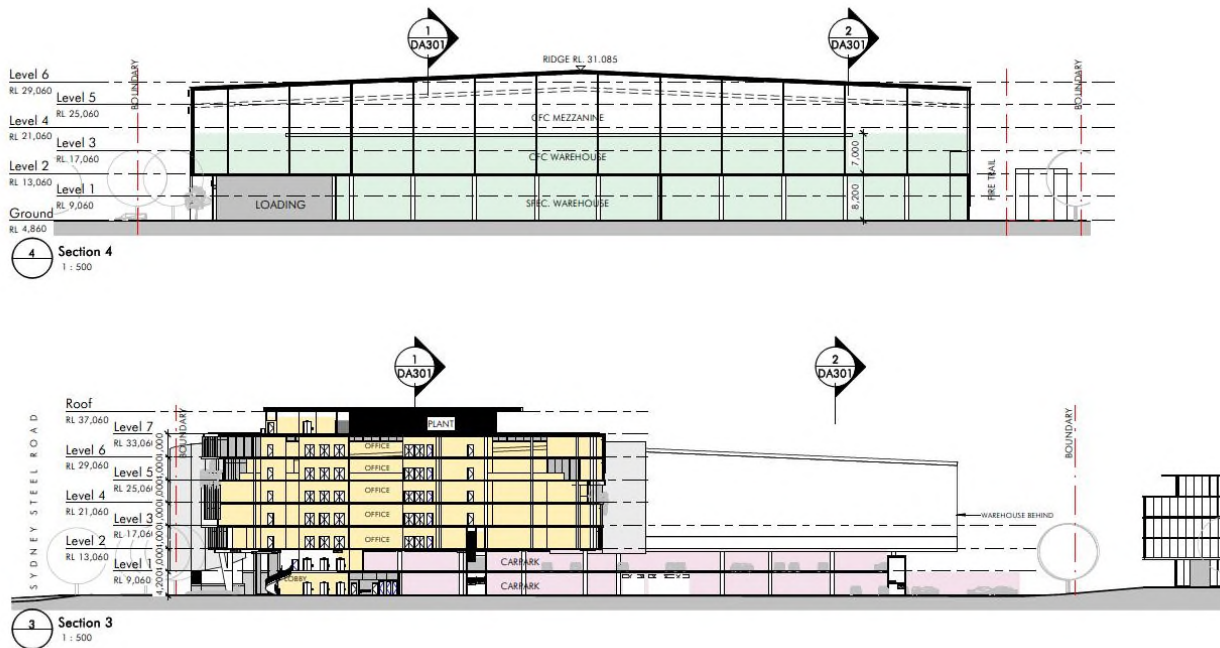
Short sections showing indicative structural systems of the two buildings.
